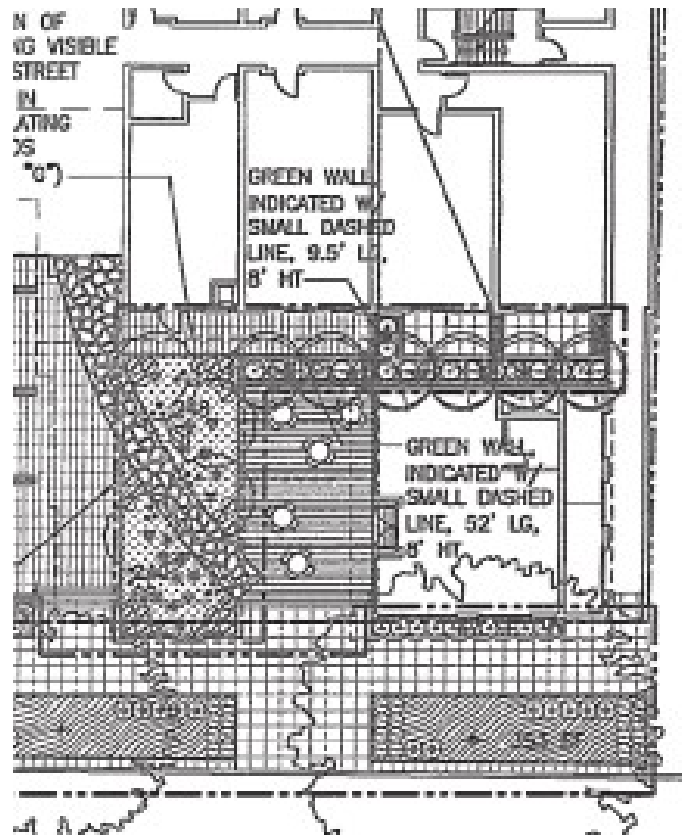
Green Façade Design example, adopted from SGF case study, Chloe Apartments Landscape Plans
